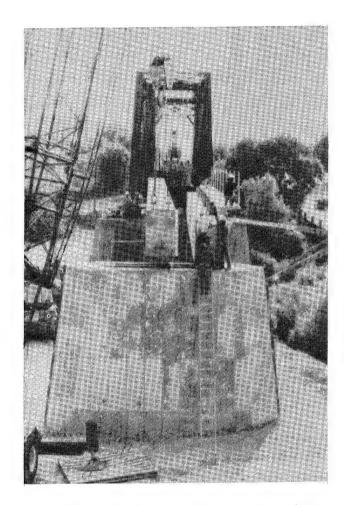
Interior box girders placed on piers during Southern Pacific bridge replacement (from Marianos 1991)
